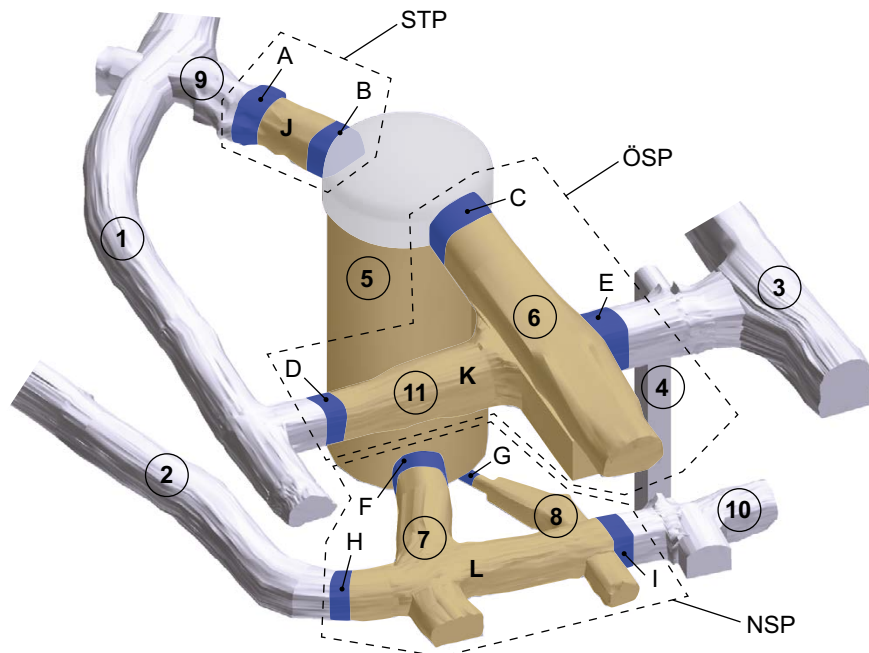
Illustration of closed silo with three plug sections (NSP, ÖSP and STP). Blue colour shows concrete plugs (A-I) and brown colour shows hydraulically tight sections (J, K, L). Key to numbering: 1) Construction tunnel, BT 2) Lower construction tunnel, NBT 3) Central tunnel, CT 4) Connecting shaft 5) Silo 6) Loading-in building, IB 7) Silo bottom tunnel, 8) Drainage tunnel 9) Silo roof tunnel, 1STT 10) Terminal part of lower construction tunnel 11) Silo tunnel. Tunnel parts 1, 2, 3, 4 and 10 belong to the tunnel system.
